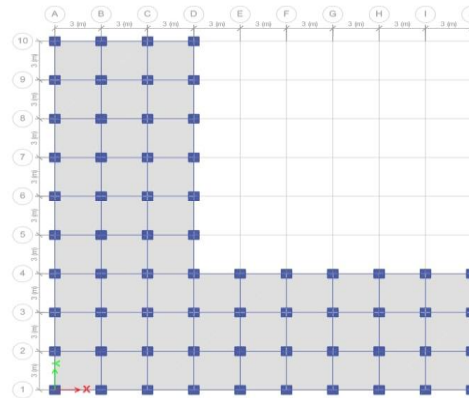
Plan View Showing the Column Grid Arrangement of the Unsymmetrical Structure
